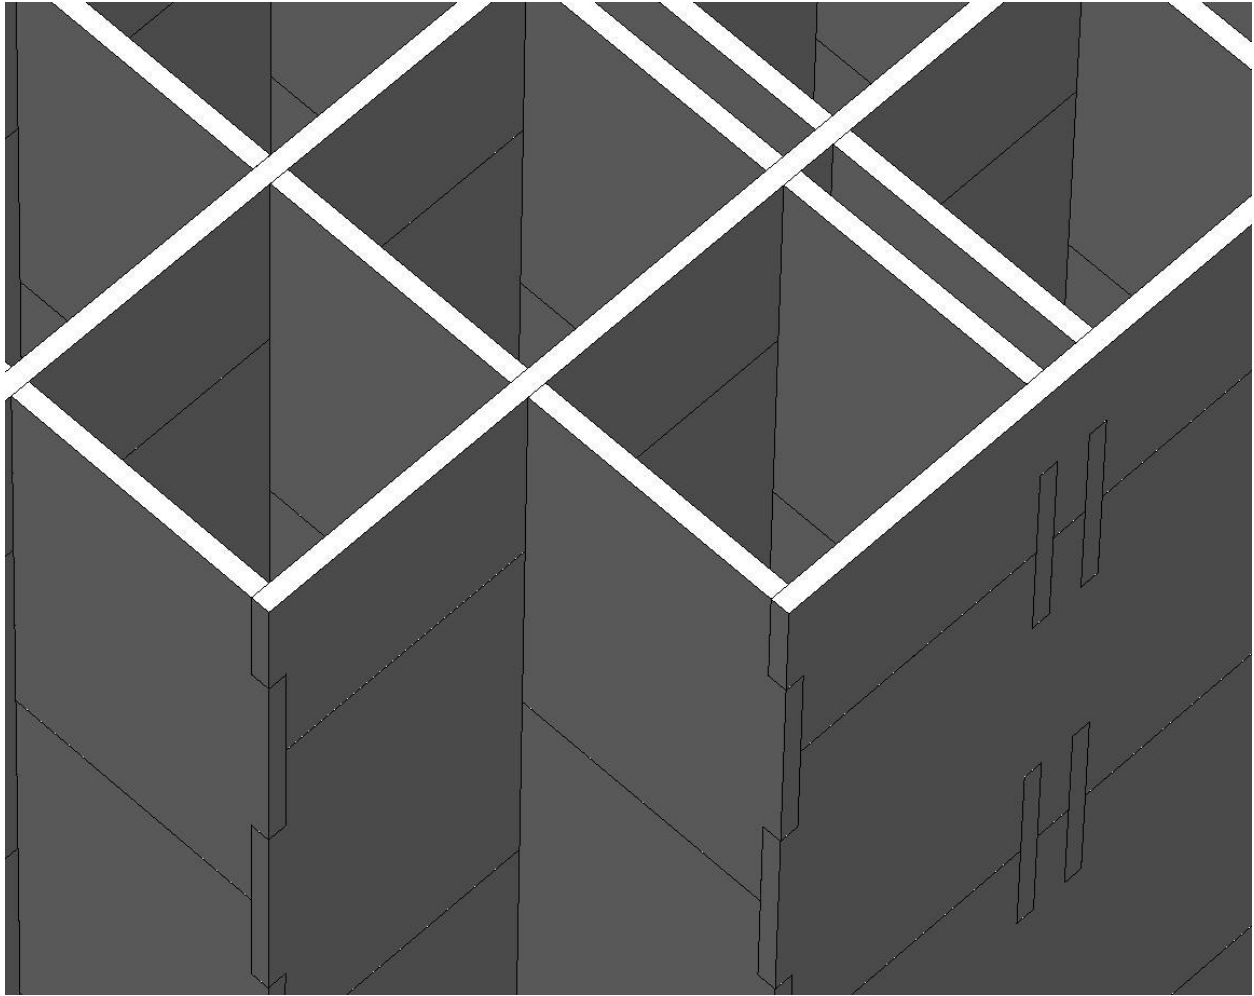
Close Up View of the Interlocking Plate Connections
